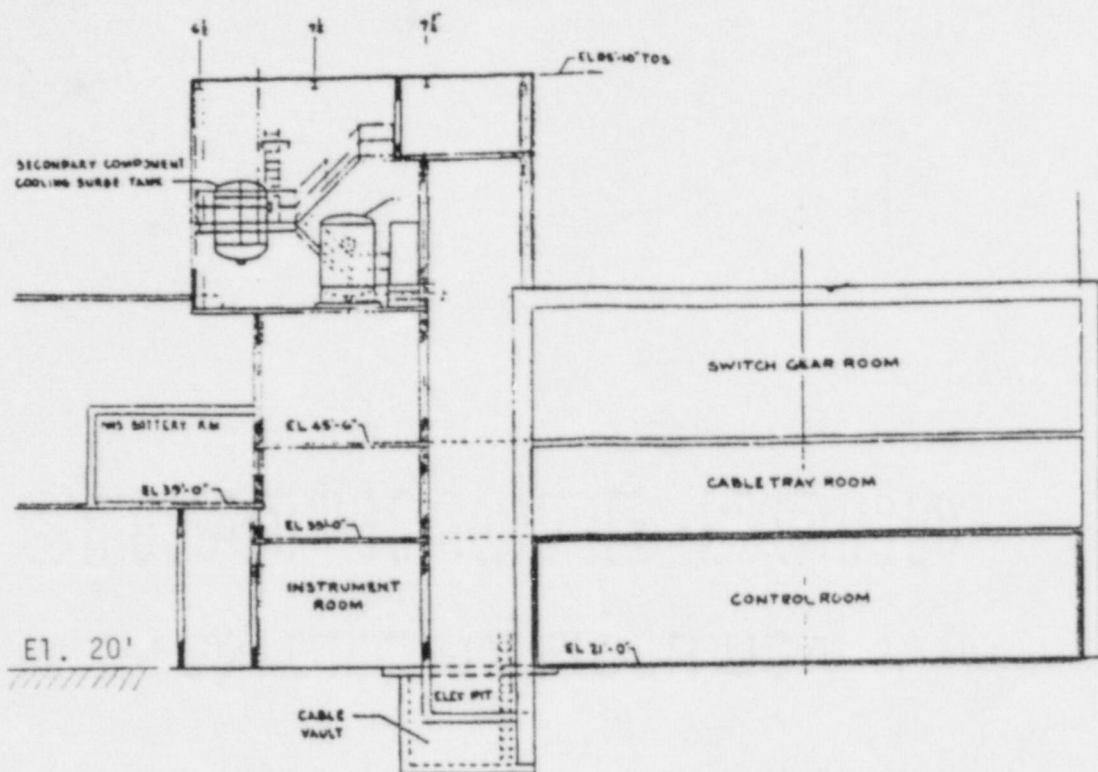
Elevation and Plan of the Main Control Building, including Switchgear and Cable Tray Rooms.
